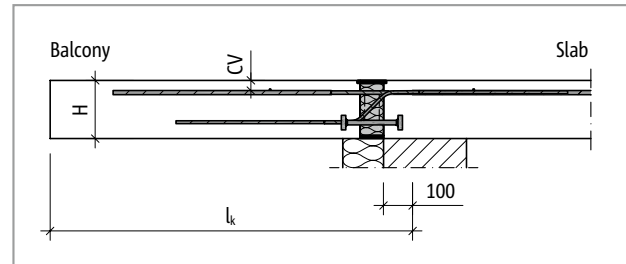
Schöck Isokorb® T type K-M12: Static system
